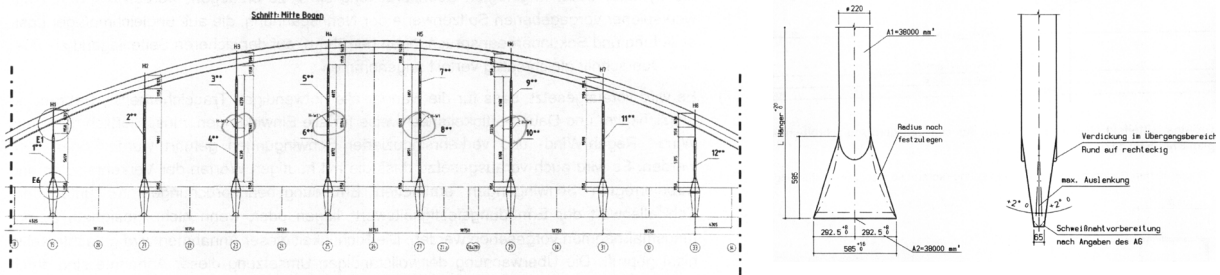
Configuration of the hangers with position of welded splices and detailing of forged ends
